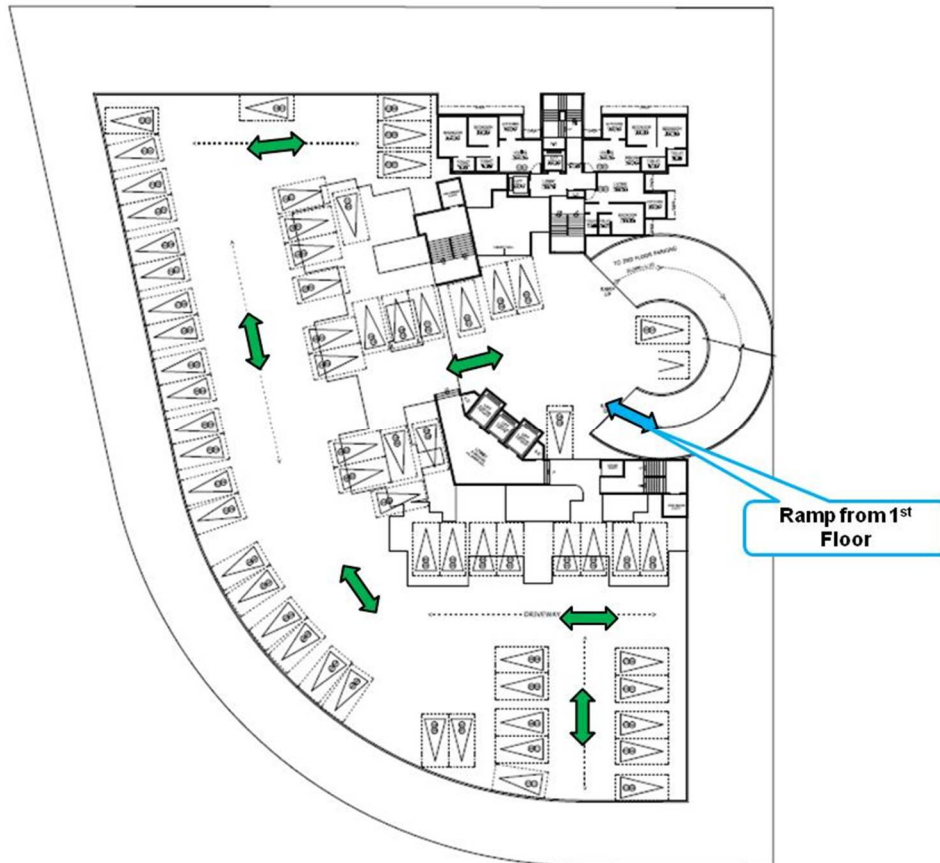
2<sup>nd</sup> and 3<sup>rd</sup> Floor Circulation Plan (Typical)
